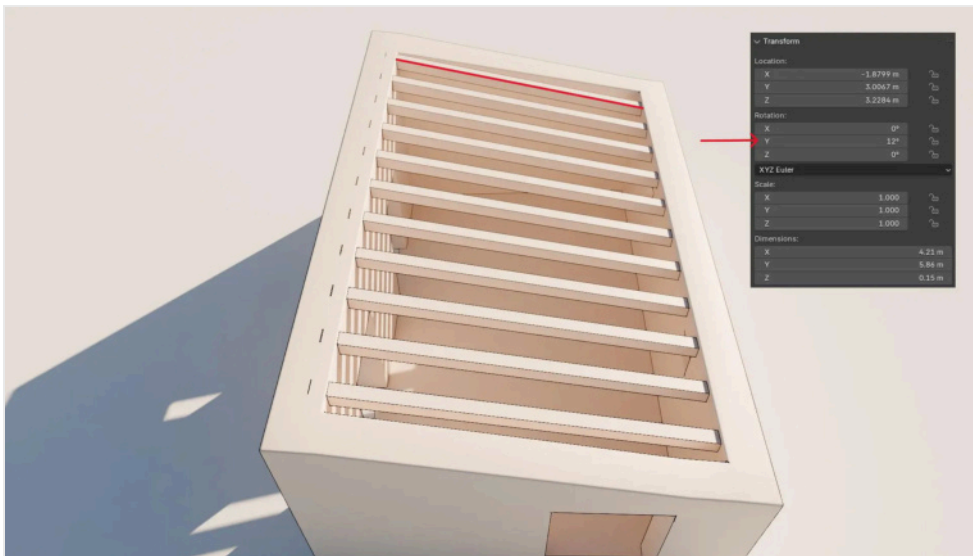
Screenshot illustrating the first attempt at modelling the roof with 15 cm beams.
